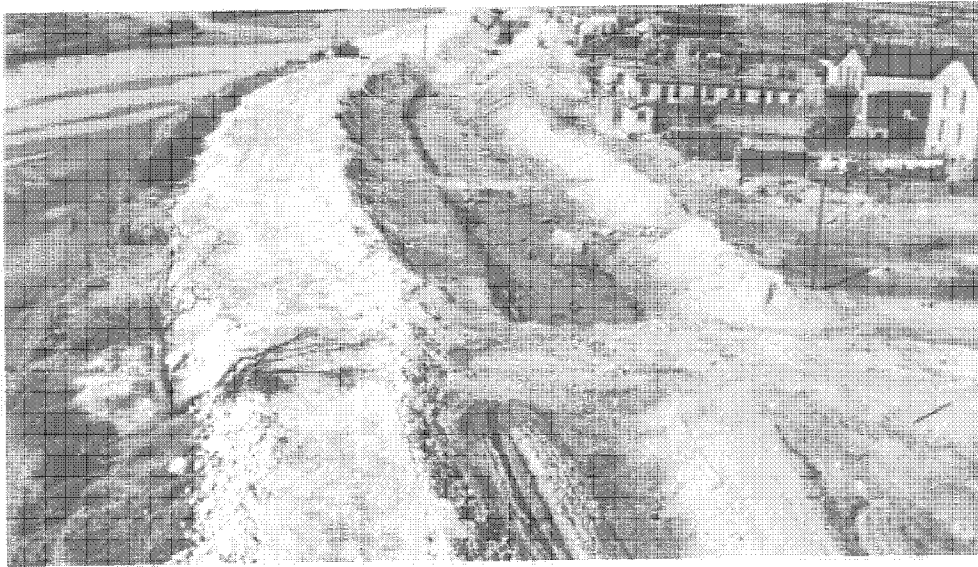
Open Section "A" Under Construction, 24 December 1937.
